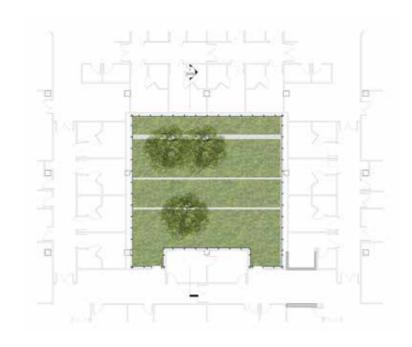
Ground Level Terraces Plan (not to scale)
